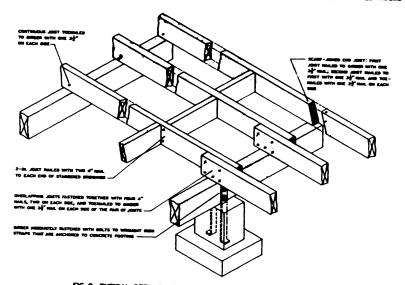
TYPICAL DETAILS OF FLOOR FRAMING BEARING CM GIRDER
